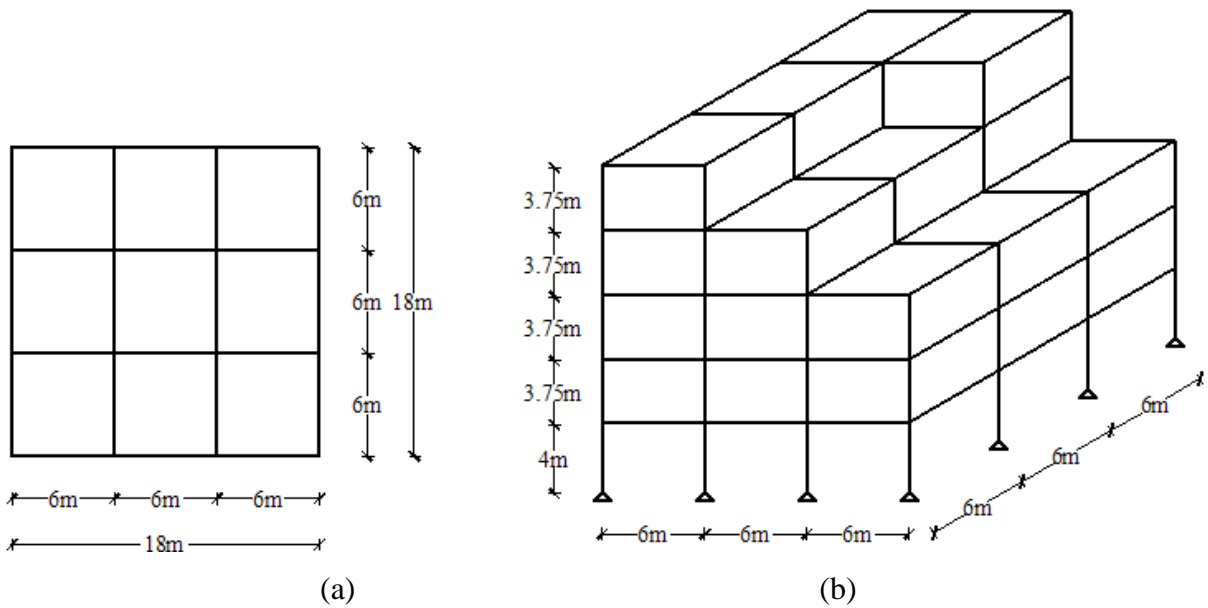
Second type of frame model (a) Symmetrical plan, (b) Asymmetrical elevation.
